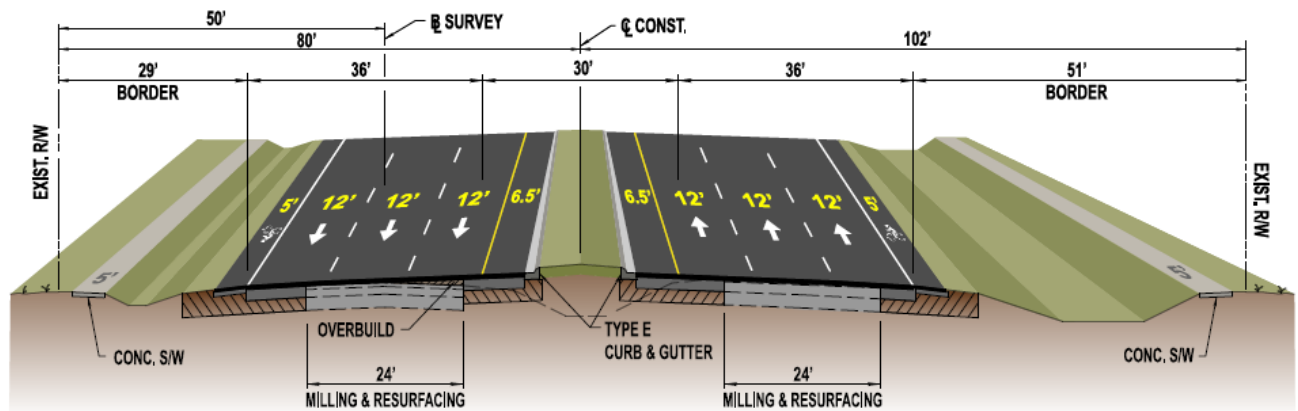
SUBURBAN NEW CONSTRUCTION TYPICAL SECTION
